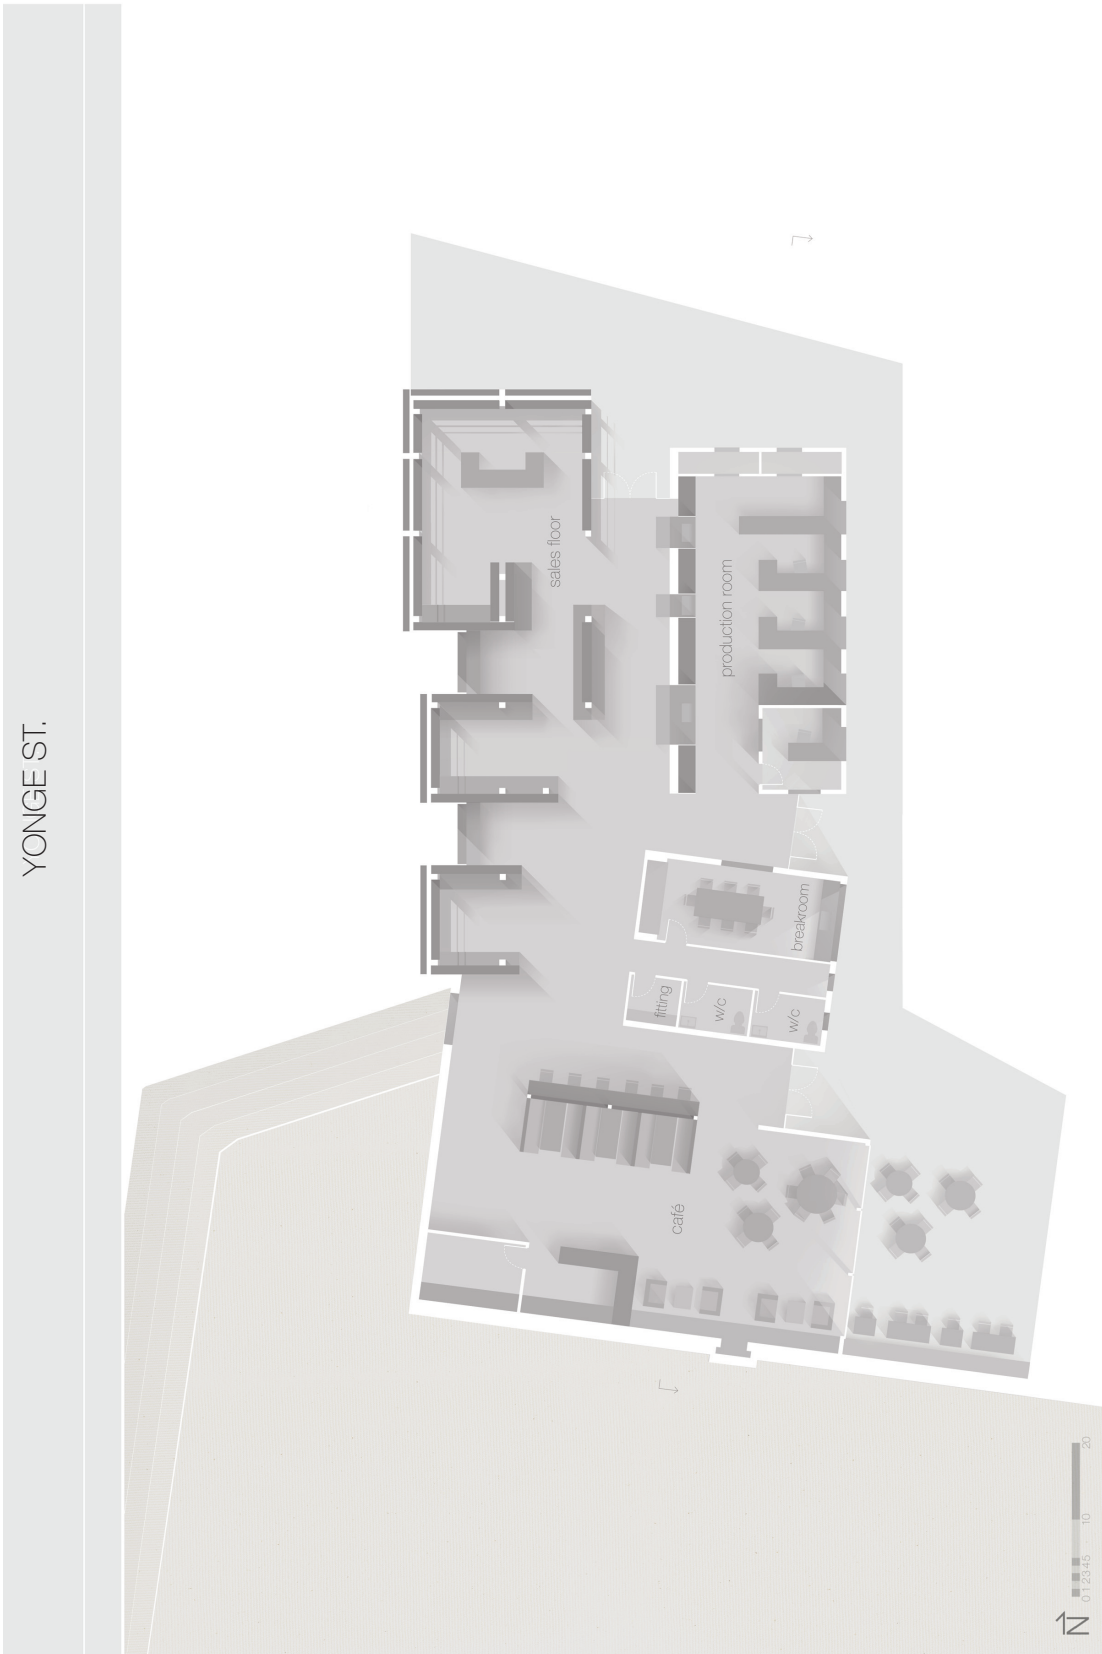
Plan of Treasures (level 1), showing how the production room, sales floor, break room and cafe connect to each other and the site.
